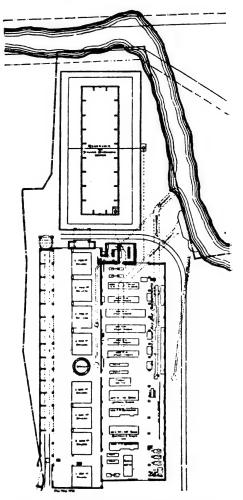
PLAN OF WYOMING AVENUE STATION.
